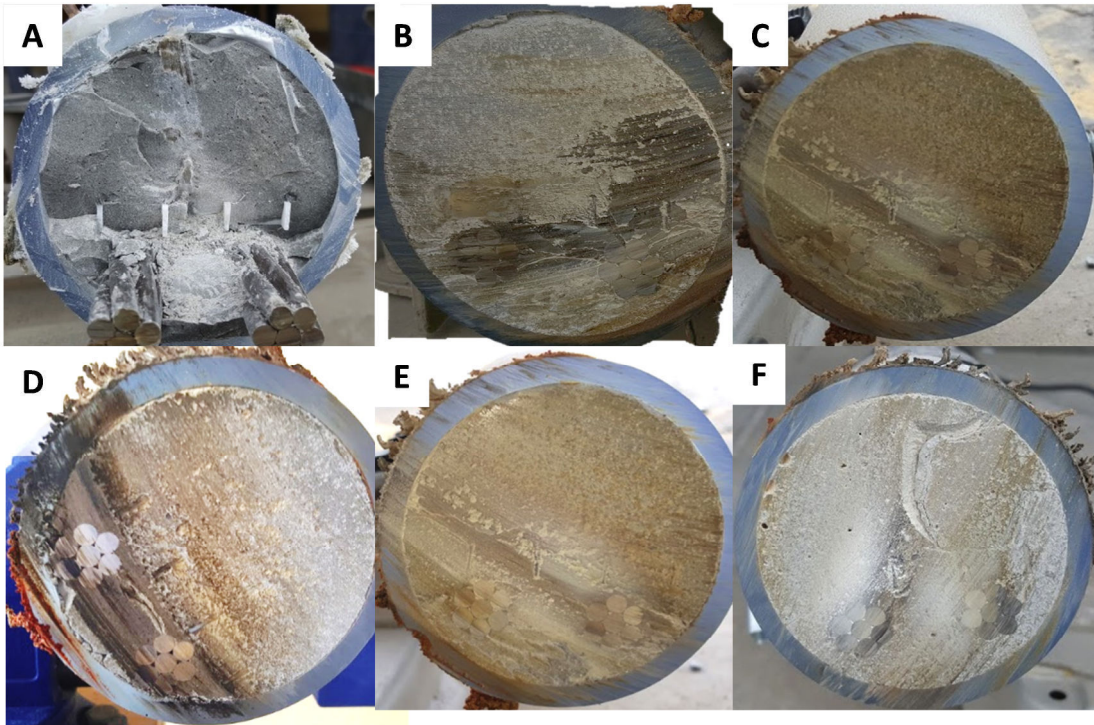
Photos of grout from lower sections of MIT test samples.
